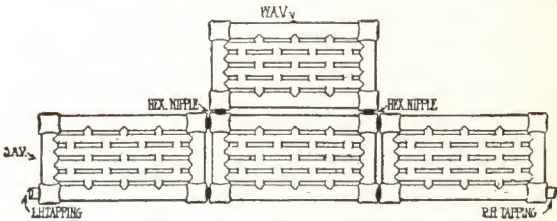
Horizontal. Four sections with two rows in center. Steam or water.
